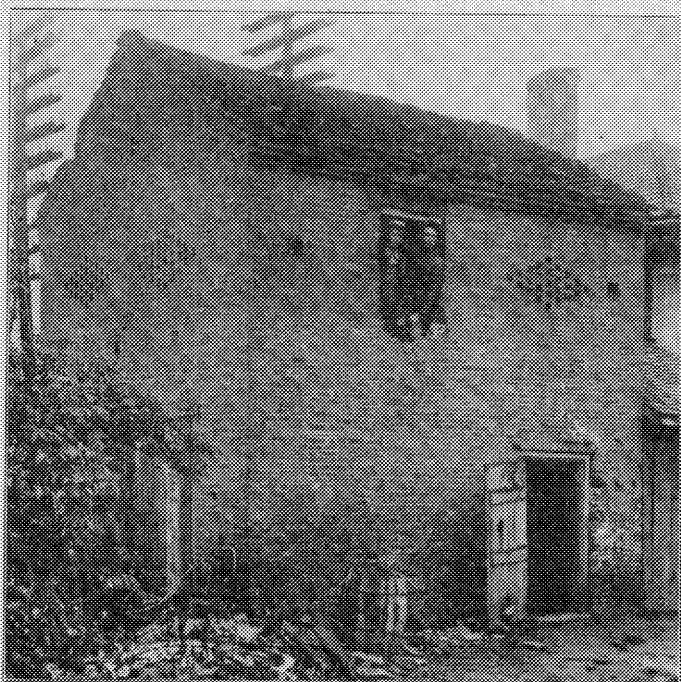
Building covered about 1814 with Tiles made at Germantown, Ohio.
